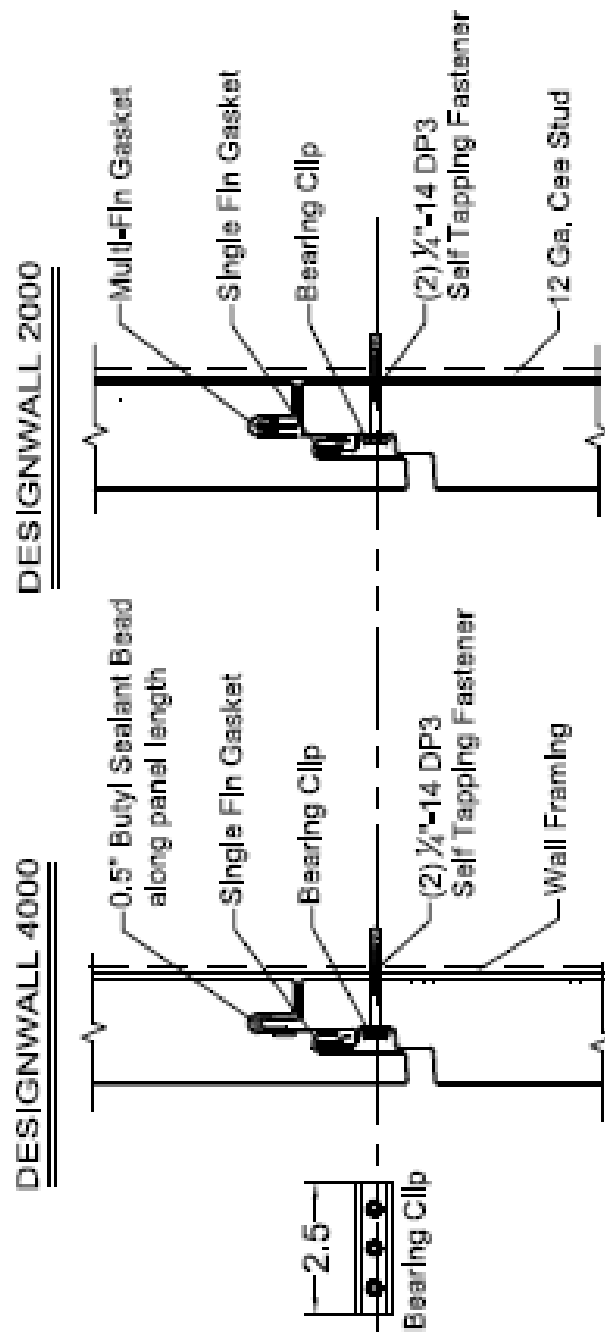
Designwall 2000 and Designwall 4000 Installation Details for the Dual Tongue and Groove Joint
